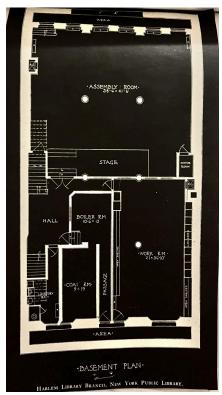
Basement plan of Harlem branch library. Thakore, A. V. Survey of the 115th Street branch of the New York Public Library, 1950.
